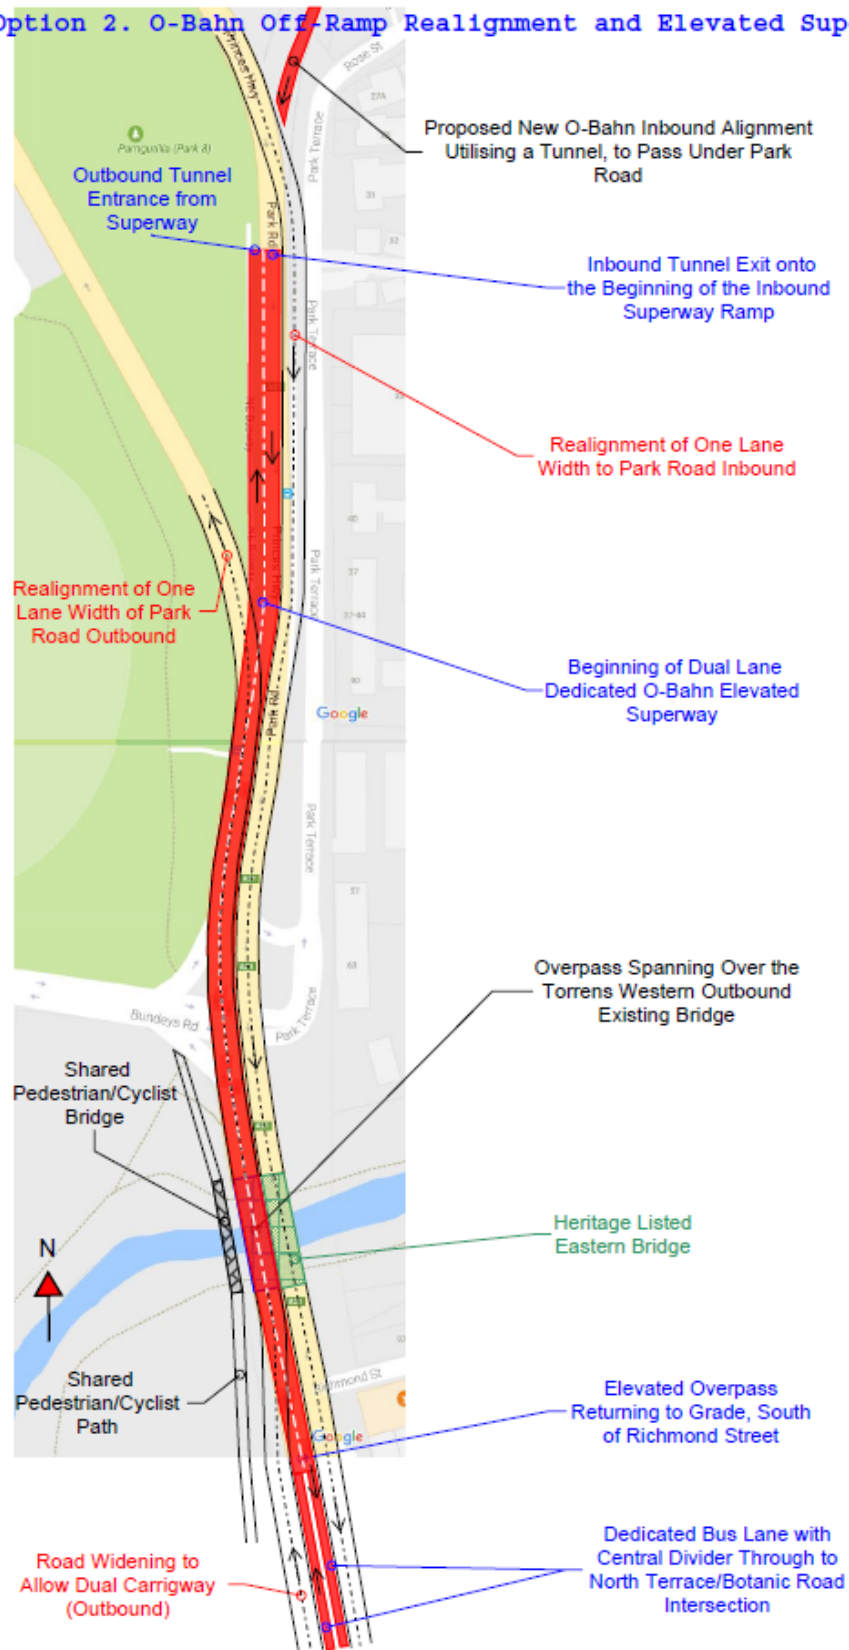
O-Bahn off-ramp realignment and elevated superway under Park Road.
